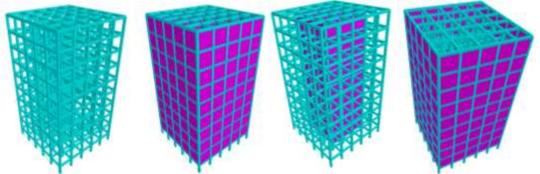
3D view of the bare infill wall frame at without, full, inner and outer respectively
